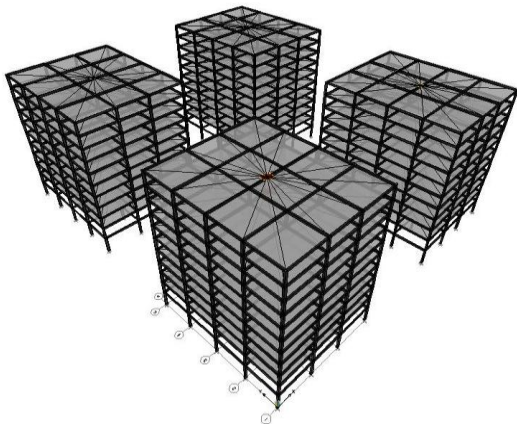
e 3D view of 10-story buildings (with setbacks)
